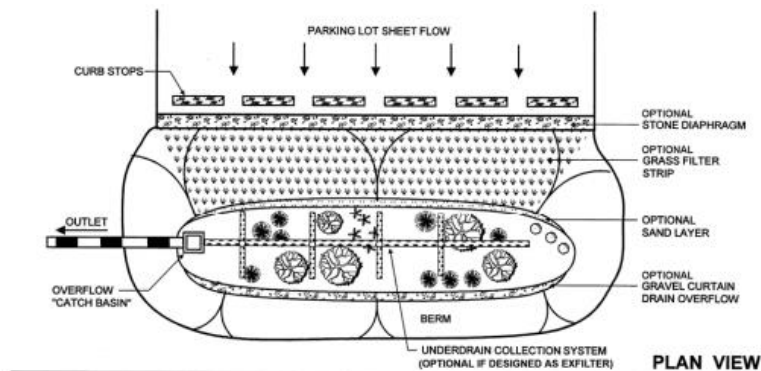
Typical plan view of a bioretention area. (Image source: Rhode Island Stormwater manual, 2010)
